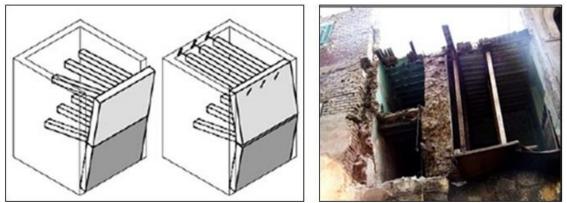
out-of-plan failure in wall 1 (main façade) at first floor
